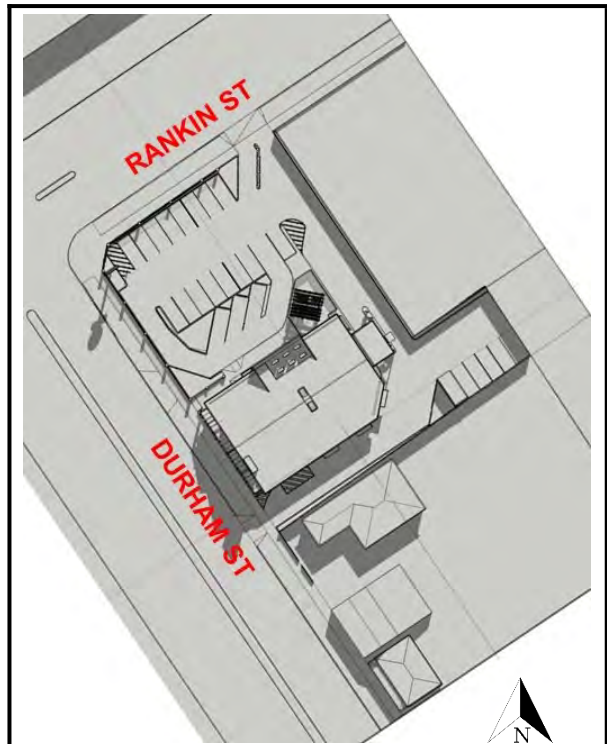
Overshadowing Plan – 12:00pm on 21 June
